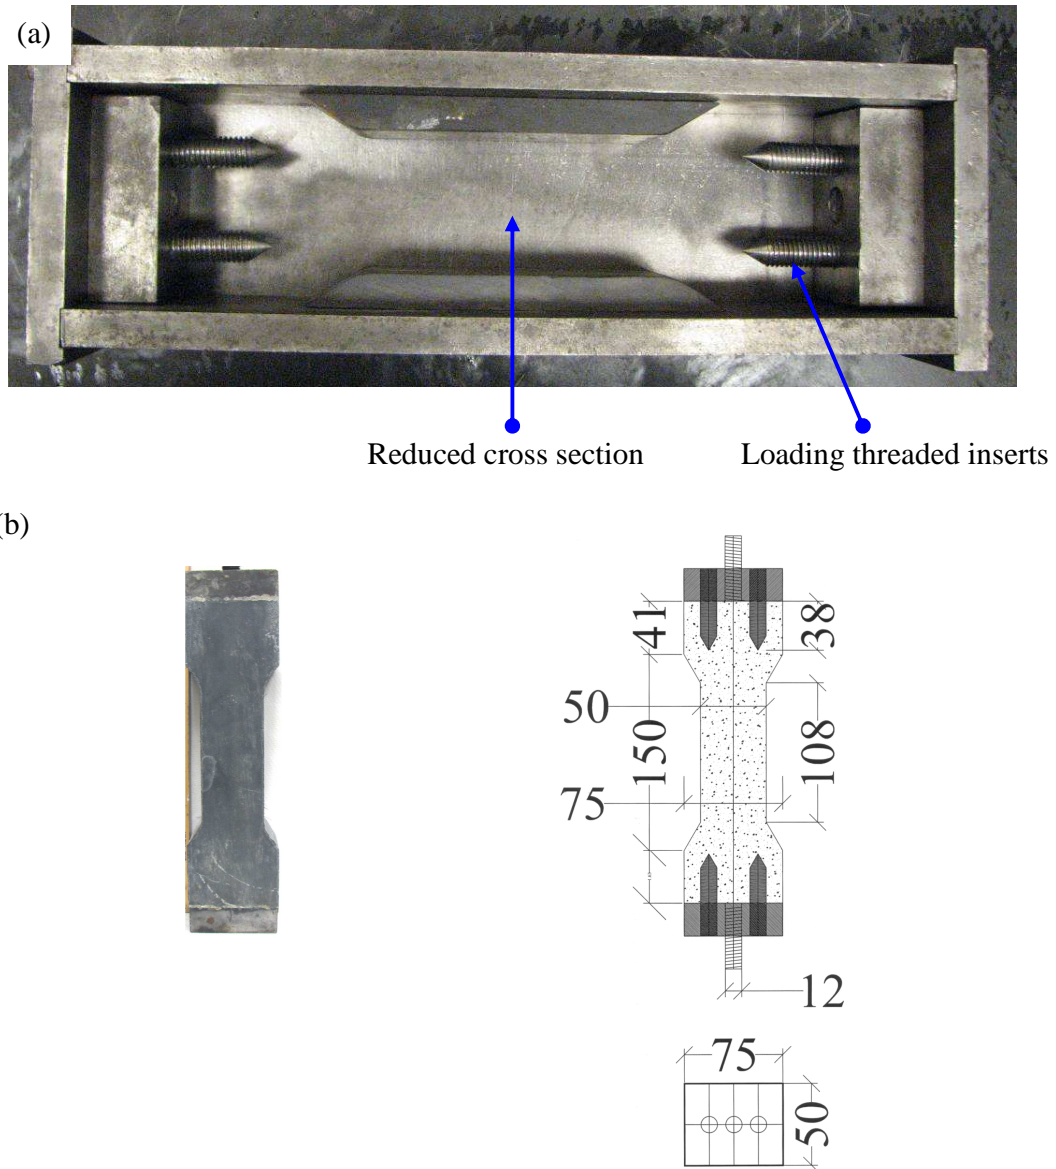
Tensile strength test specimen (a) mold and (b) dimensions (mm)
